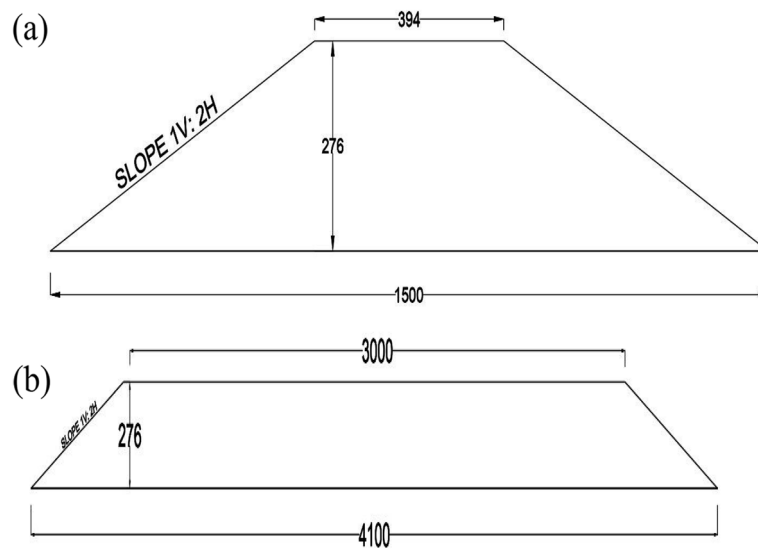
a Lateral Cross-Sectional Details of Model (all dimensions in mm). b Longitudinal Cross-Sectional Details of Model (all dimensions in mm)
